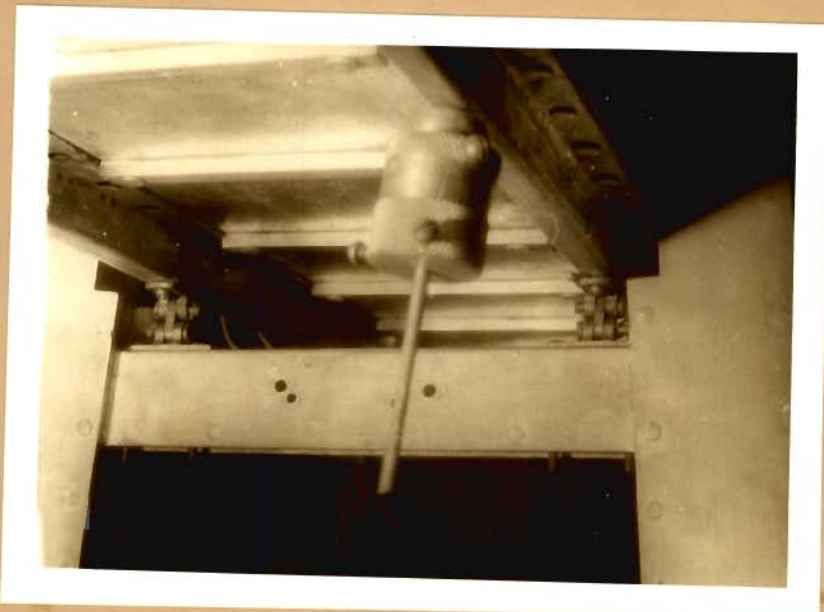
\_ ANCHOR BLOCK AT TOP OF TOWER
